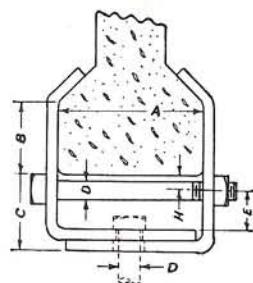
Beam Clamp is used on the new style Precast Concrete Joist. It is made in two pieces and formed to fit the contour of the concrete joist. The supporting hanger rod, when locked into position by means of two hexagon nuts, provides a rigid connection.
